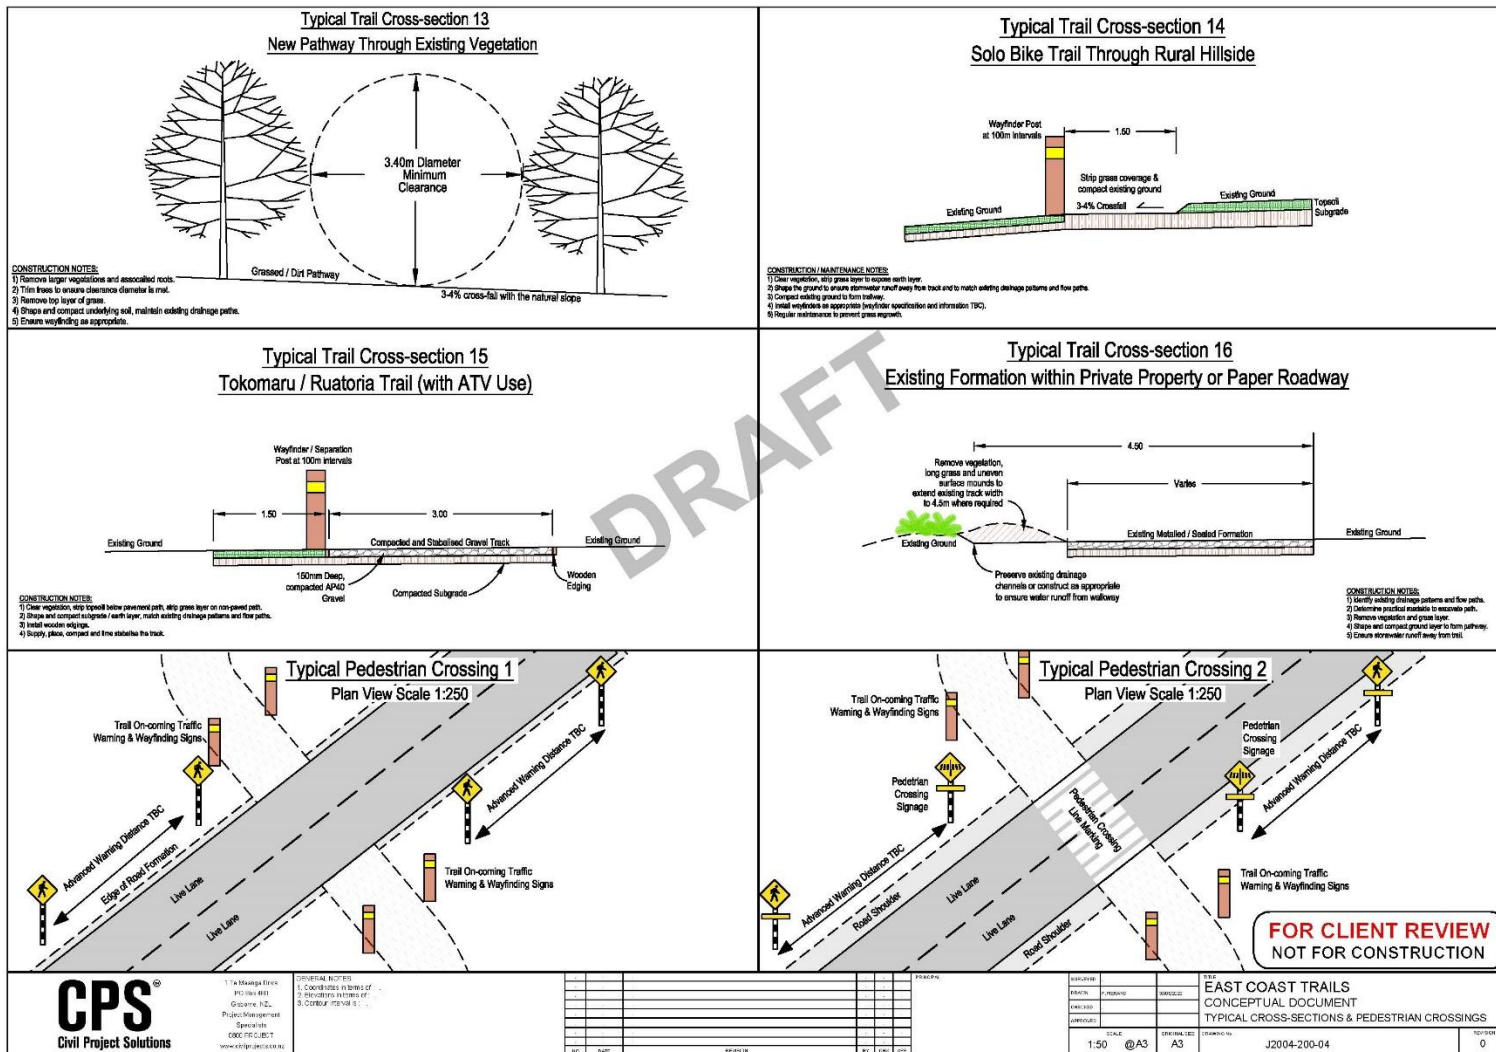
Concept drawings of the proposed trail tier constructions (Source: Civil Project Solutions).
